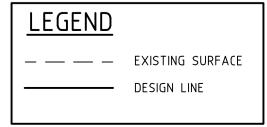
EHL-01-17 Sheet No. 17 of 40
